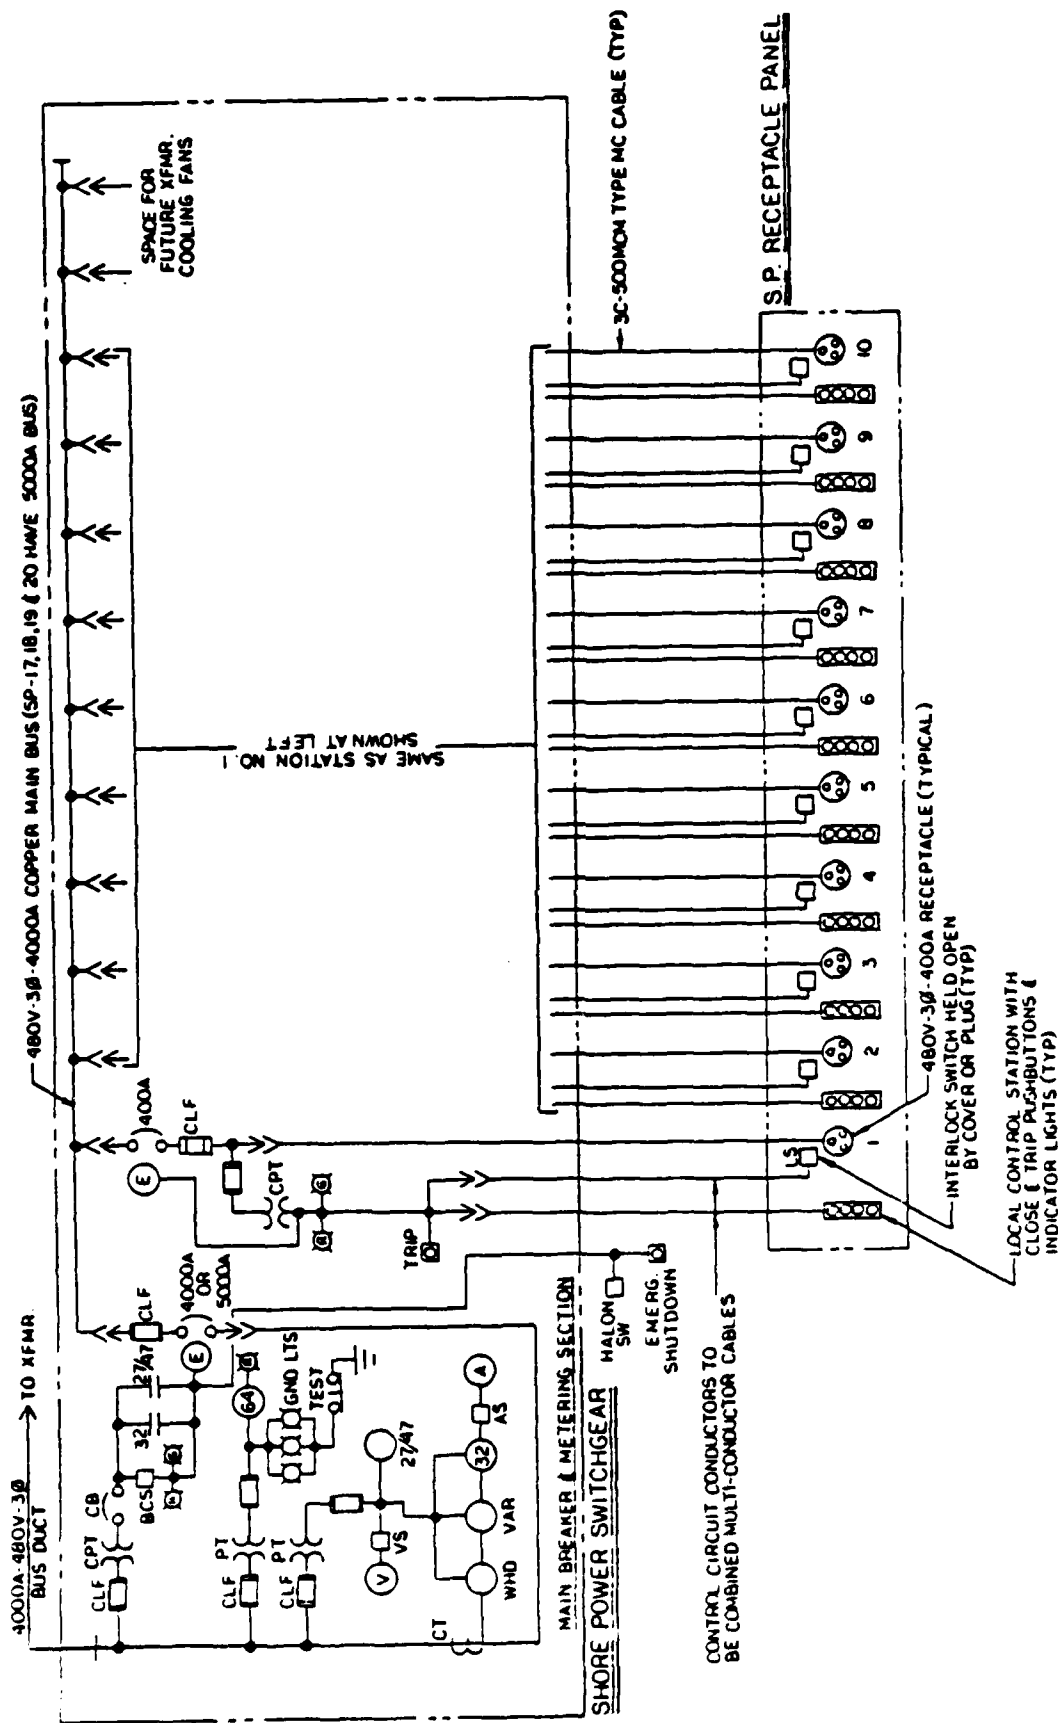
Typical Electrical Shore Power Switchgear and Receptacle Panel
